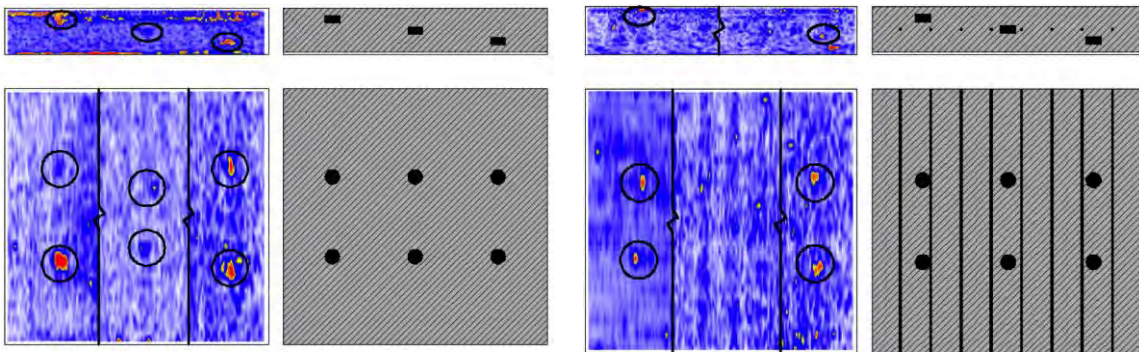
Medium clay lump slabs: (left) without reinforcement, and (right) with reinforcement.
